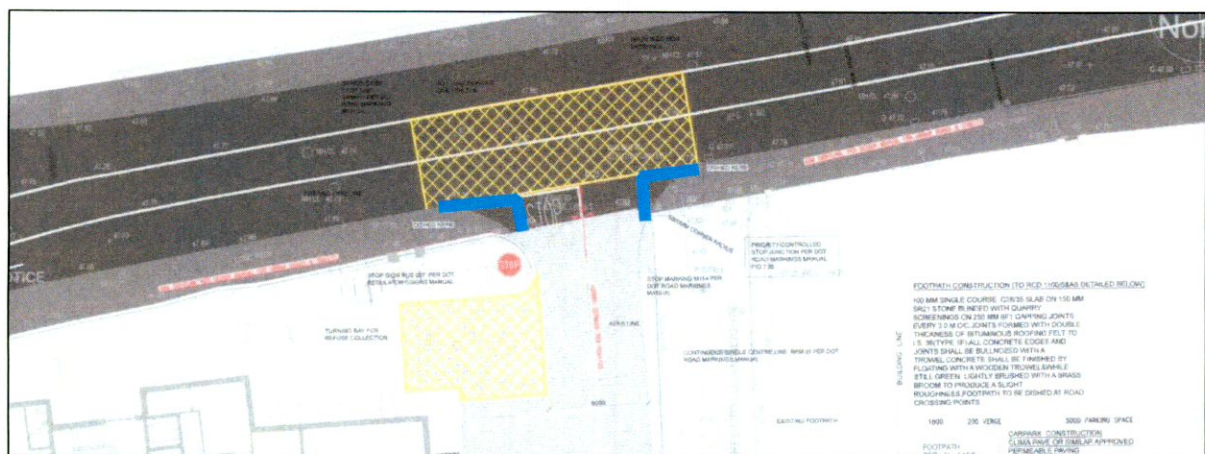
Site layout plan outlining the traffic calming measures proposed by the applicants.
